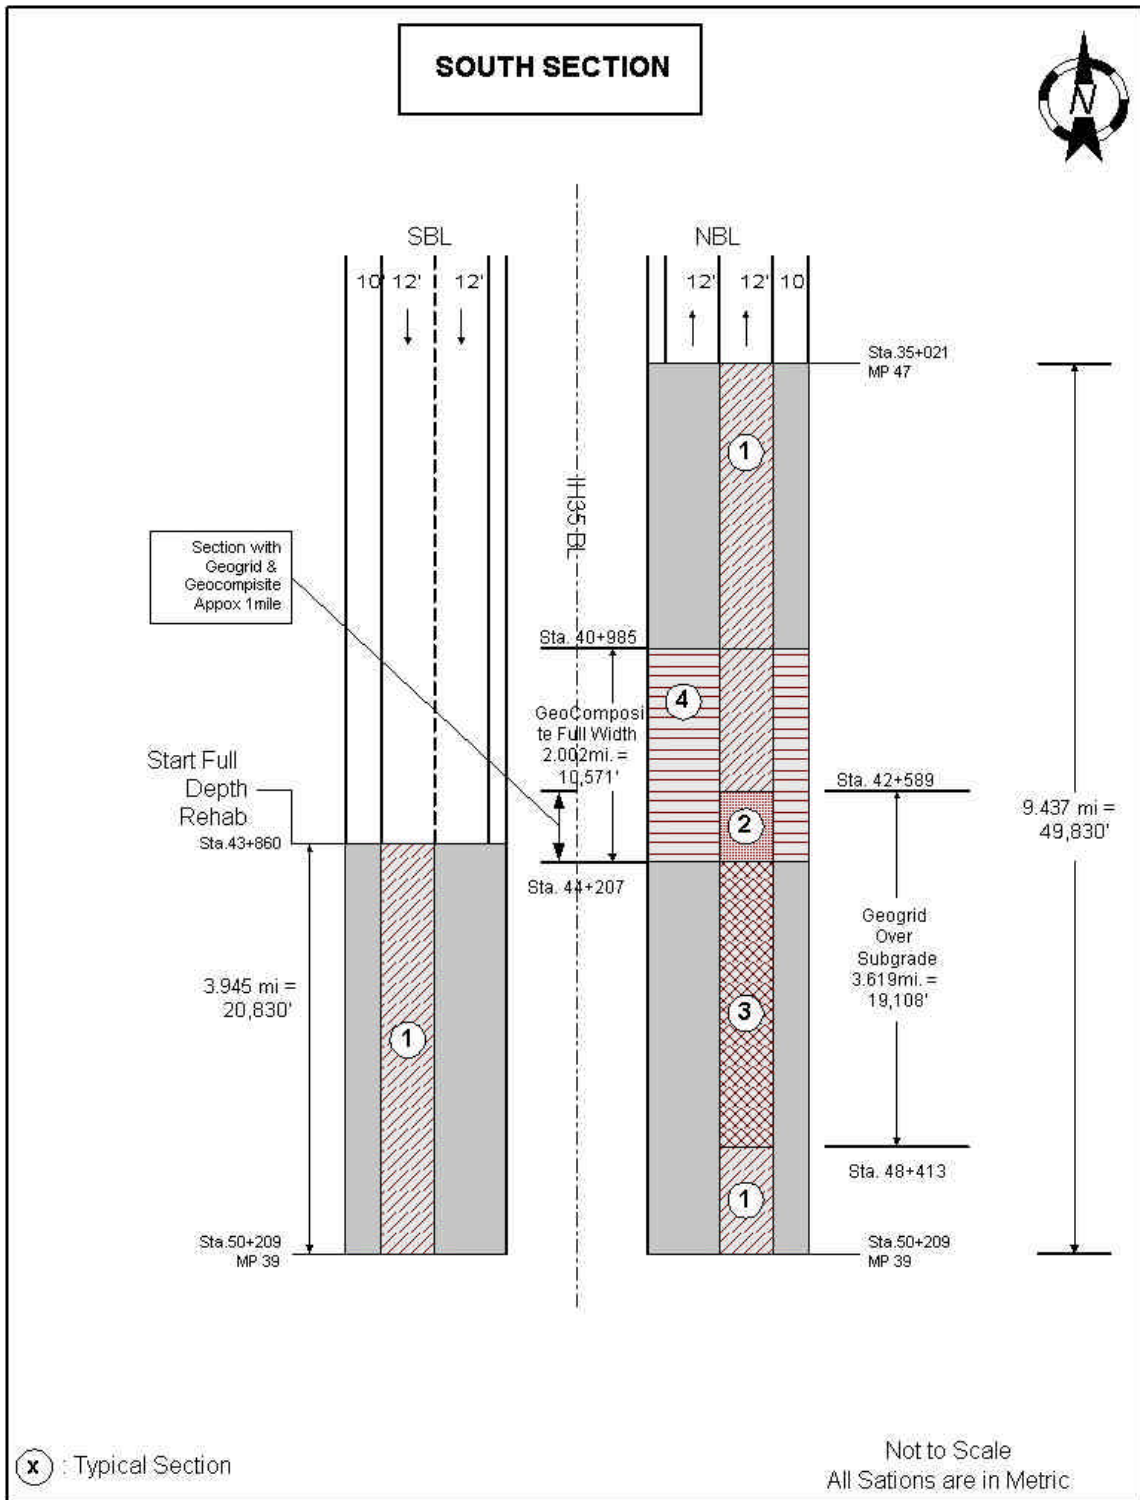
Plan View of South Section of IH 35 in Laredo District.
